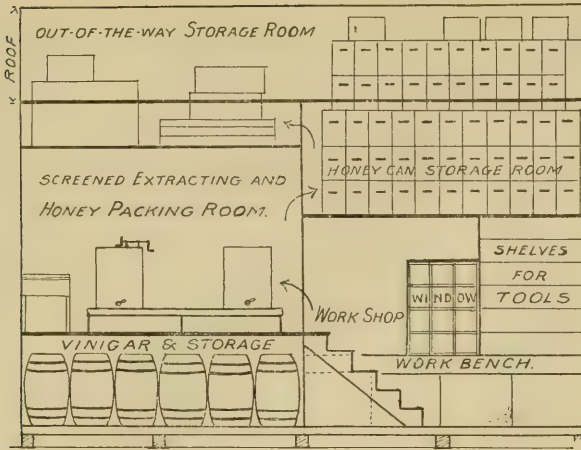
CROSS-SECTION OF SCHOLL' HONEY-HOUSE AND WORK-SHOP, SHOWING THE FOUR FLOORS.
